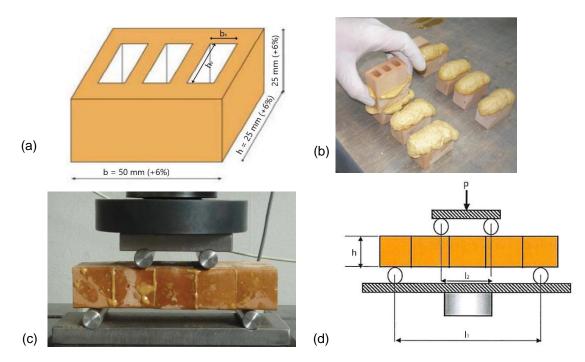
Sample preparation and test equipment for bending strength test: (a) small scale block, (b) gluing of blocks, (c) specimen in four-point bending test equipment and (d) positioning of test specimen.
